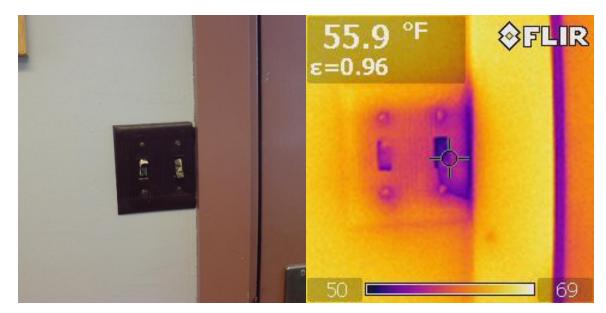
Infiltration Detection—Light Switch on Exterior Wall
